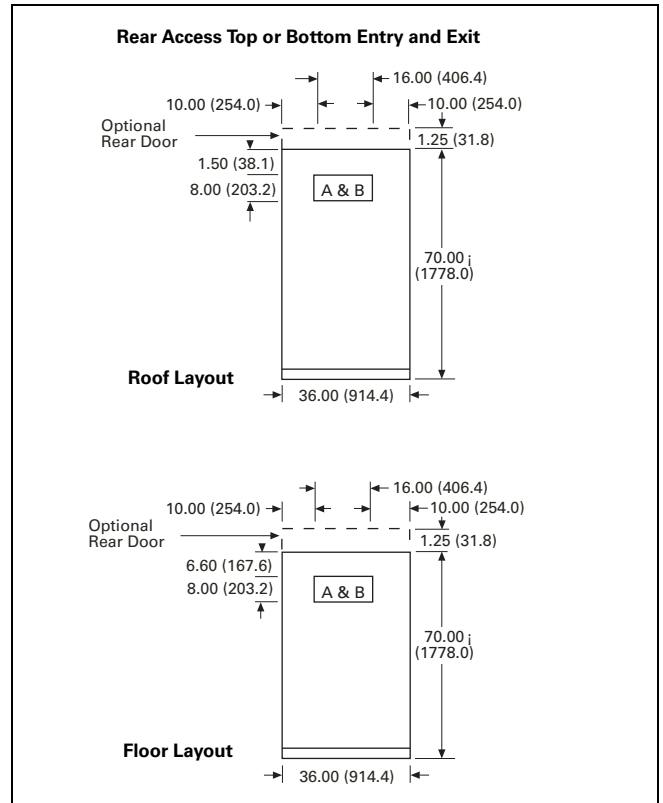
5 and 15 kV Roof Layouts and Floor Layouts
